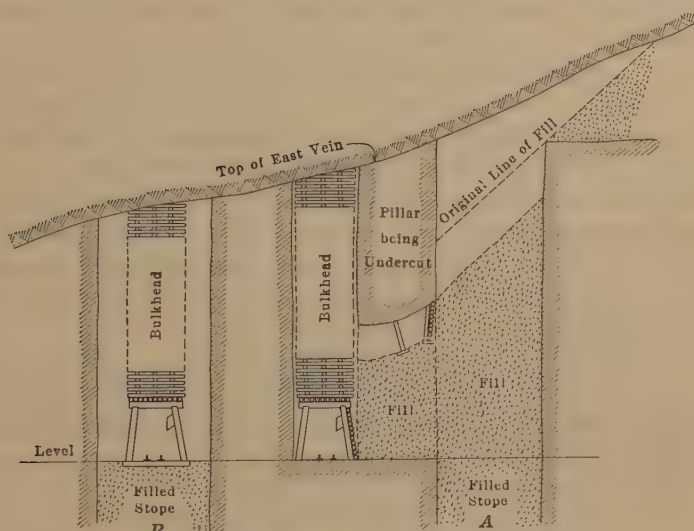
METHOD OF UNDERCUTTING PILLAR.
